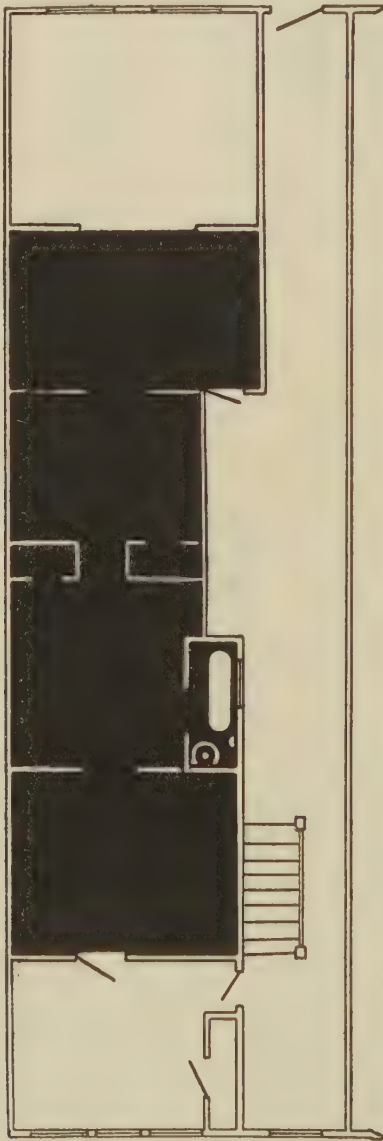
FLOOR PLAN OF ONE OF A SERIES OF BASEMENT APARTMENTS. The dark room on the right measuring 3 x 7 feet was used for sleeping purposes.
